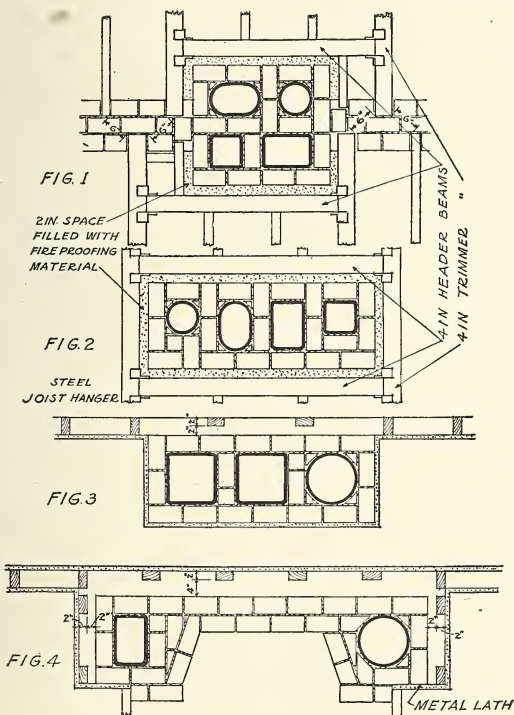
Floor framing around chimney in a party wall, to secure proper space between ends of floor joists.
